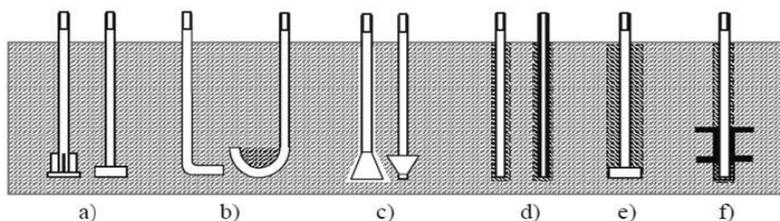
Types of anchor bolts a) cast in-situ anchor bolts b) hooked bars c) undercut anchor bolts d) bonded anchor bolts e) grouted anchor bolt f) anchoring to grillage beams
